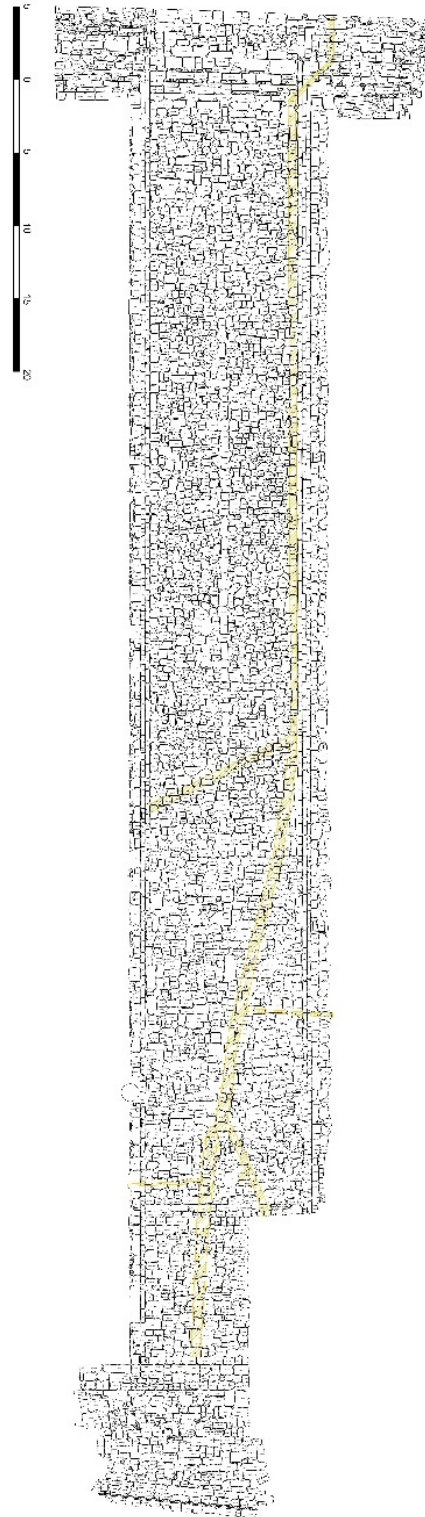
Drawing of Phaselis Main Street North Section Stone and Drainage (infrastructure) Plan After Conservation
